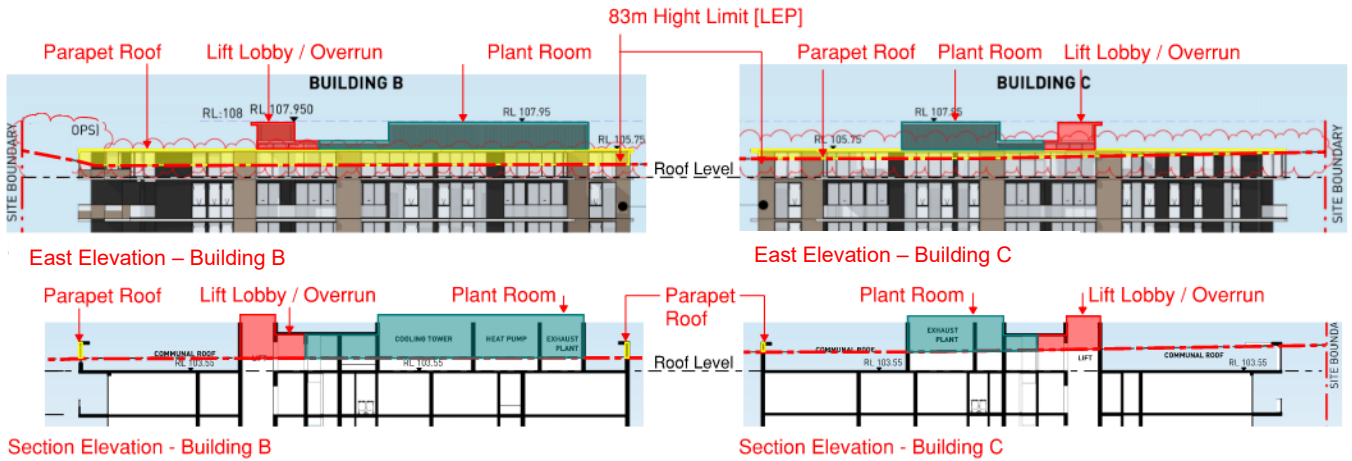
Sections showing elements exceeding the height limit i.e. plant, lift lobby/overrun and parapet
